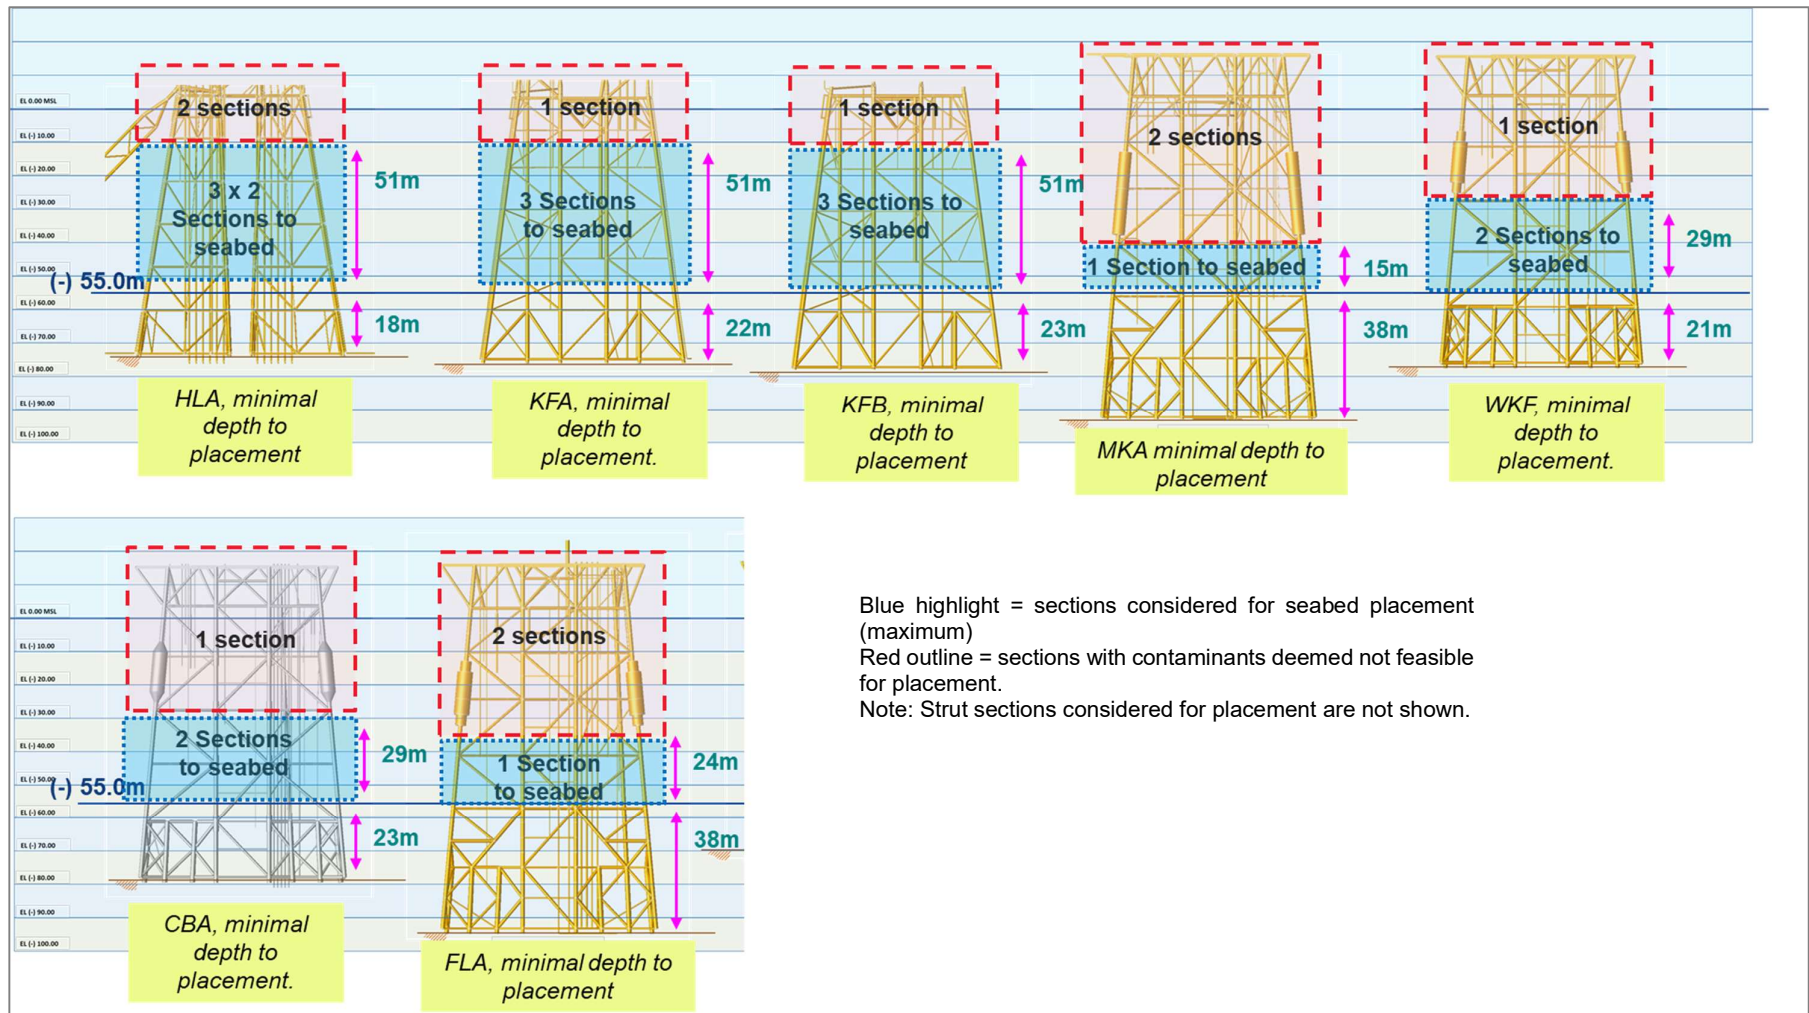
Steel Piled Jacket removed sections considered for seabed placement
